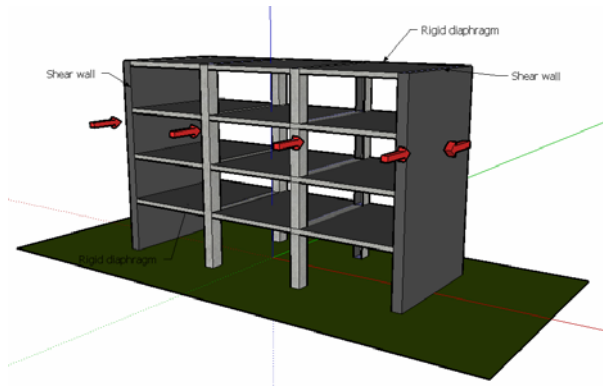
When the horizontal forces are transferred by shear walls, the horizontal floor planes are usually` designed as rigid diaphragms where the floors act like deep thin beams in horizontal direction and carry forces from the face of the building to vertical shear walls.
